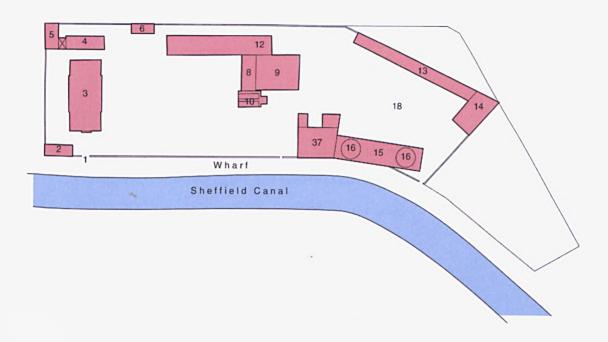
Redrawing of fig. 3.38 with building uses, 1825. Scale 1:1500, north is at top right (author).
